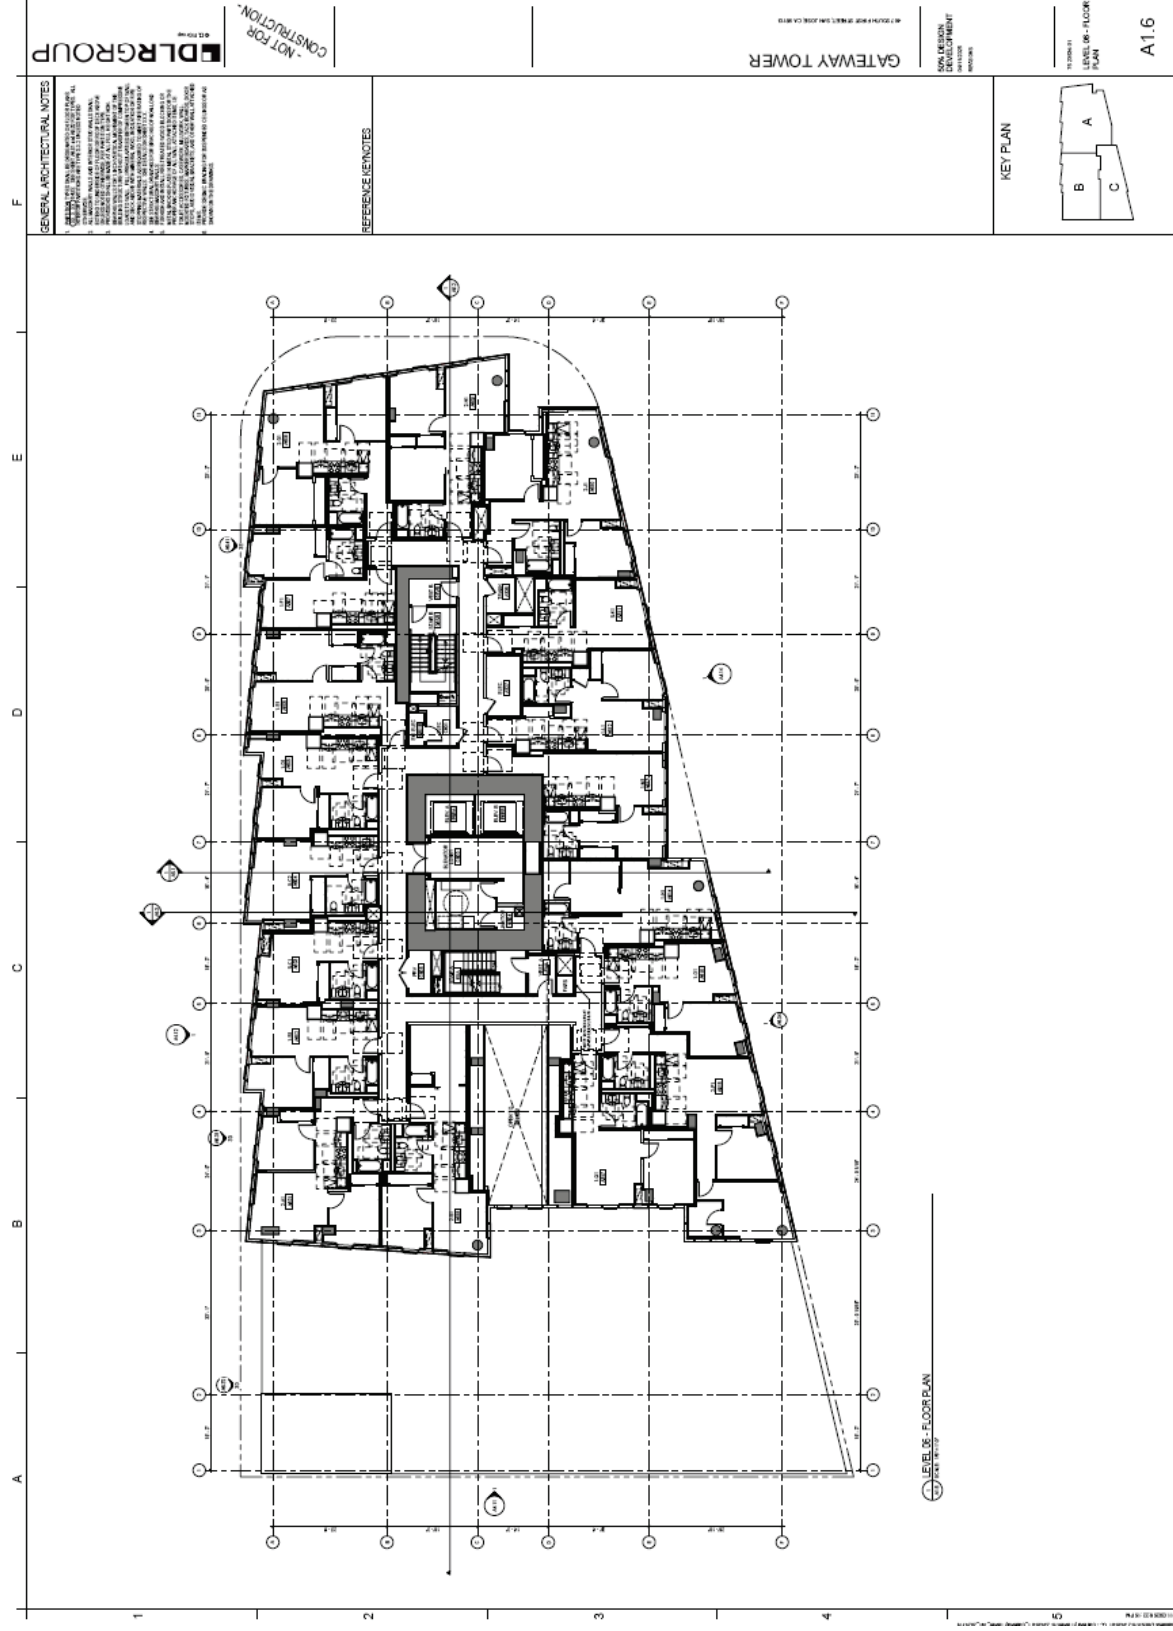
Level 6 Floor Plan (floors 7-15 similar)
